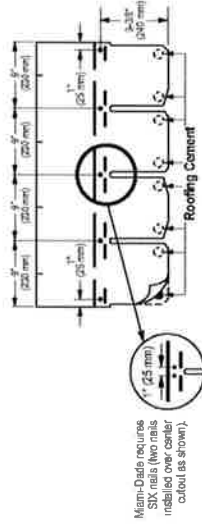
Use FIVE nails and eight spots of asphalt roofing cement under each tab corner.
